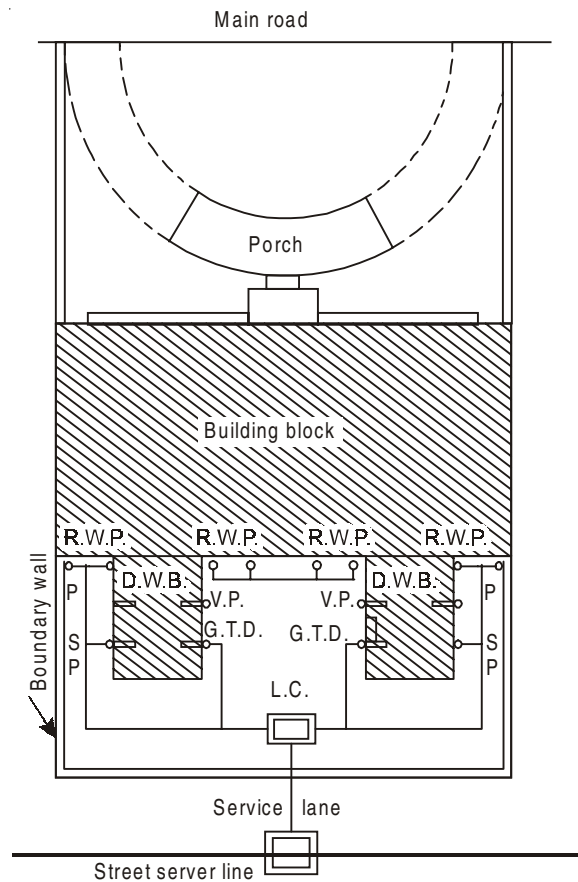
Typical drainage layout plant of a terrace house drained at back.
